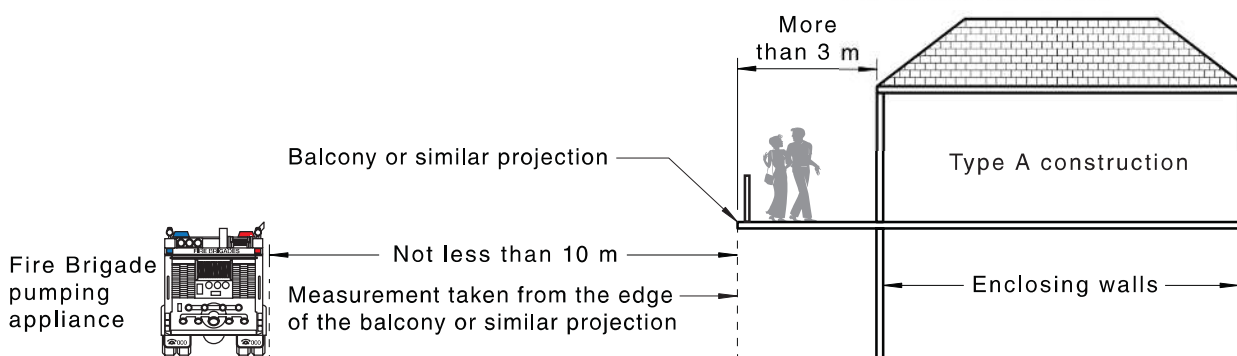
\(C\)](#) highlights the application of the design principles used when measuring from a fire brigade pumping appliance to a building with a balcony.
